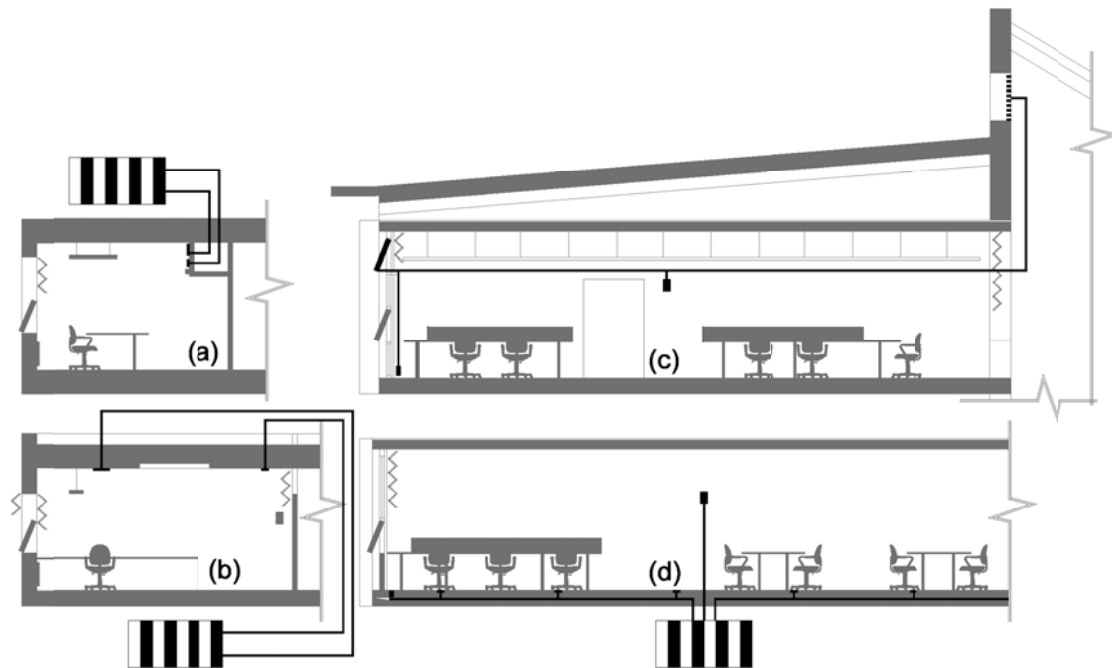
Sections, centrally controlled ventilation systems in (a) Building A, (b) B, (c) C, and (d) Building D
